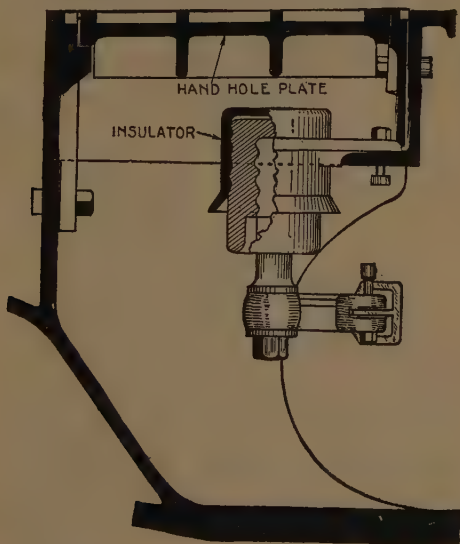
,692.—Section of underground conduit showing handhole at each insulator; these are located 15 feet apart, manholes being provided every 150 ft.
